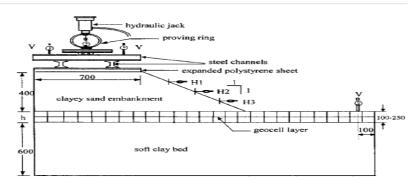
Sectional view of model setup of design embankment (Madhavi et al. 2006)
